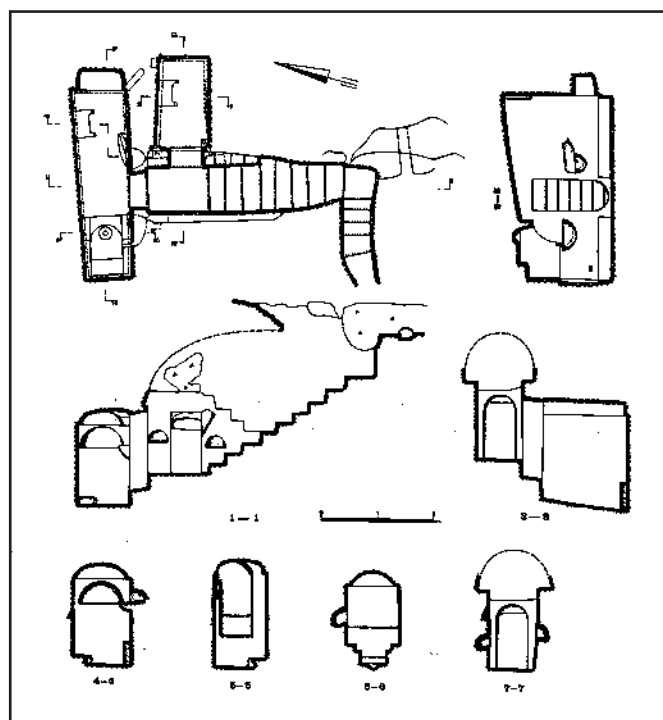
Plan and sections of bath - SC 82 (Kloner, IAA).
